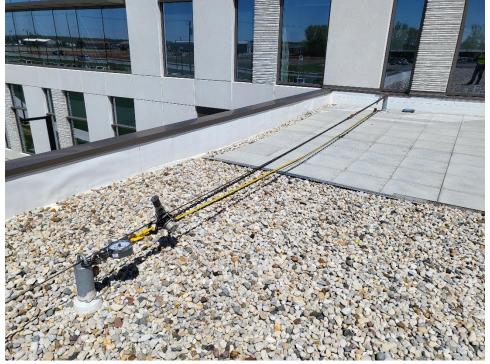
Load test between 2 tie-back roof anchors (A-11 & A-12).
